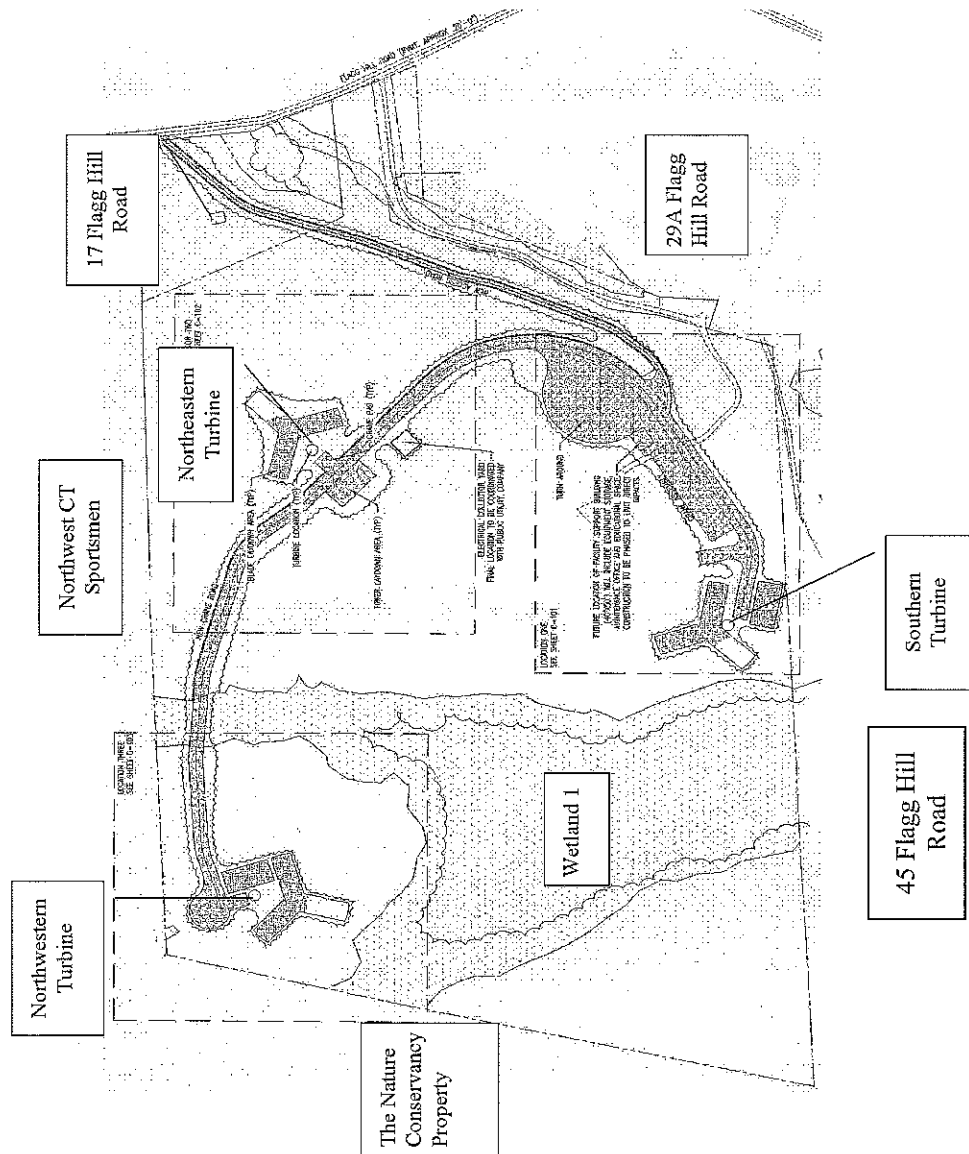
Site Plan – showing turbine locations, blade laydown areas and clearing limits.
